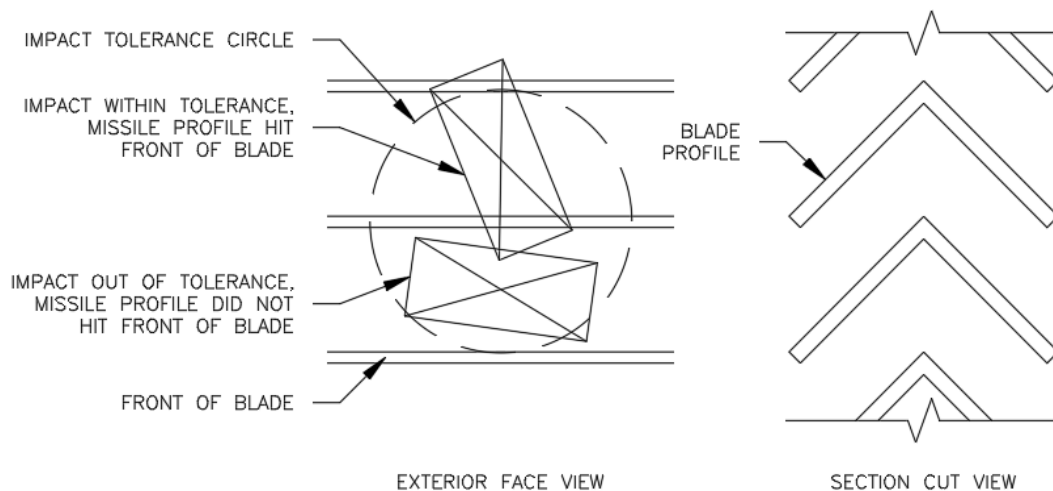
(3) LOUVER IMPACT TOLERANCE
